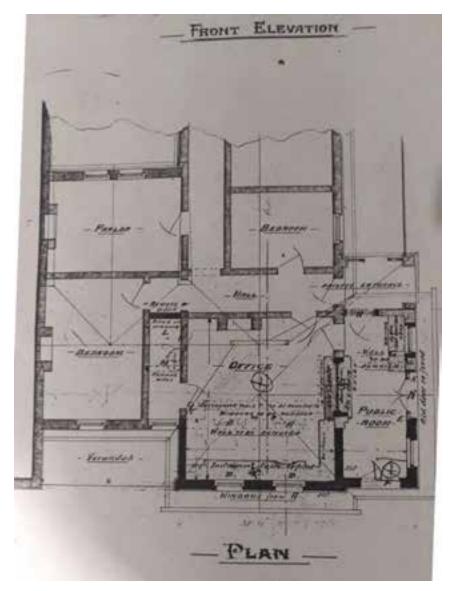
Plan dating to 1899, showing the proposed extension to the office space and public room, to form the two gabled-bays (Saleta 2016).
